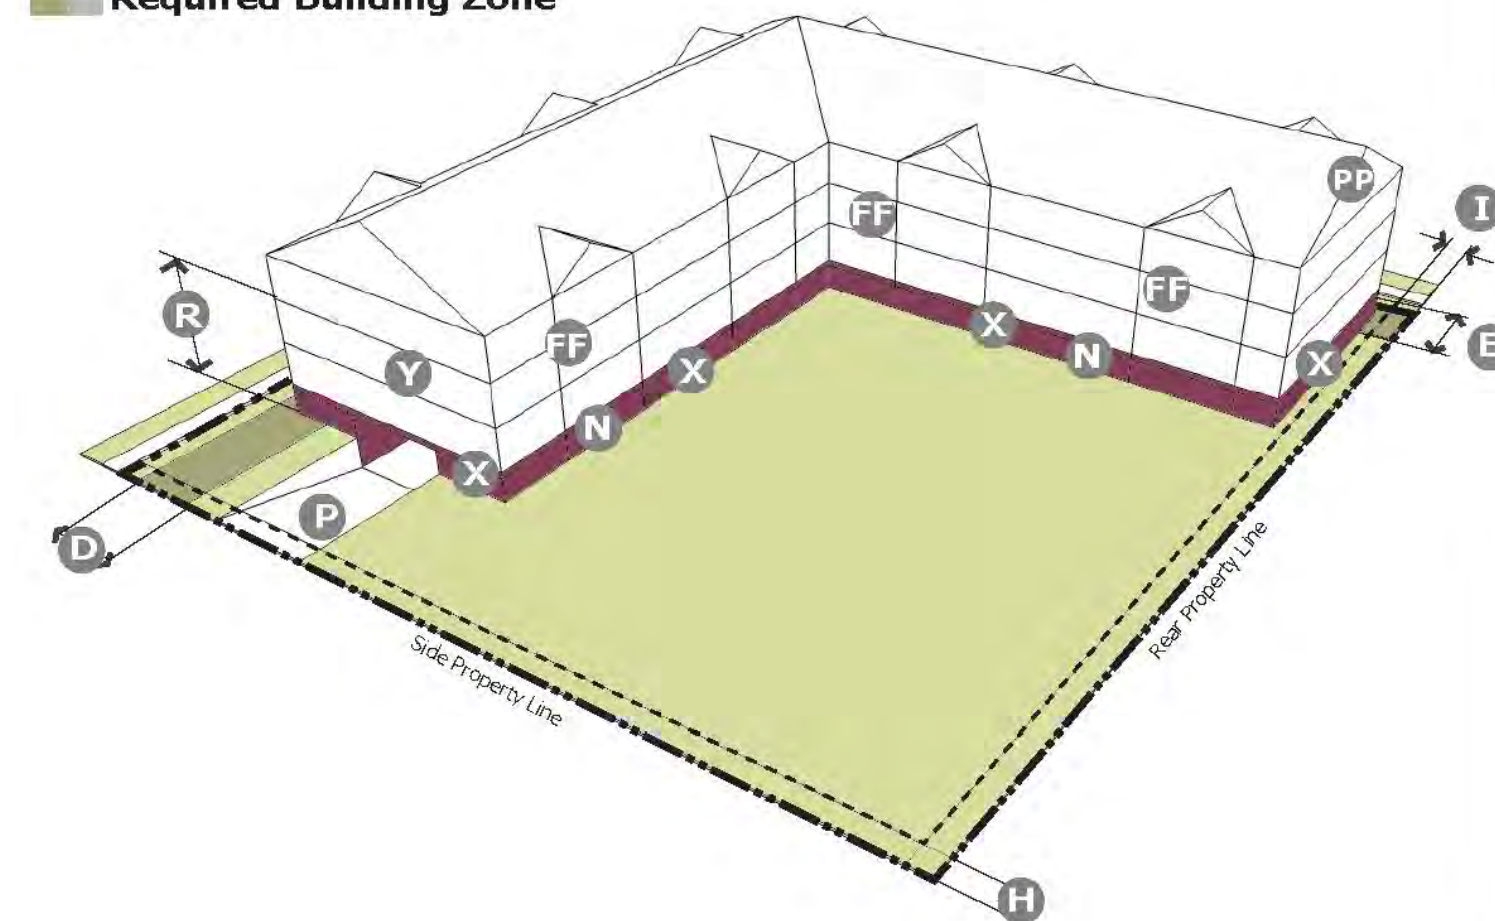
P: APARTMENT BUILDING TYPE DIAGRAM.
